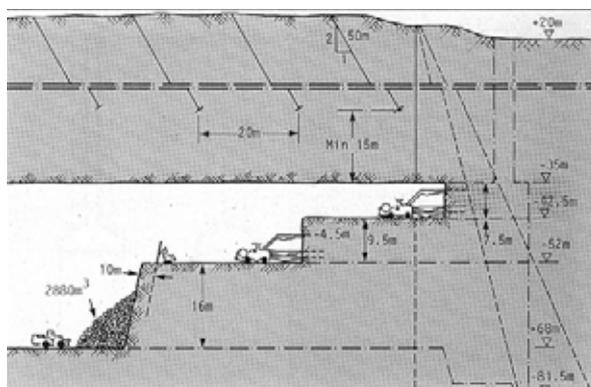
Excavation sequence Gjøvik Hall (Photo: NGI)
